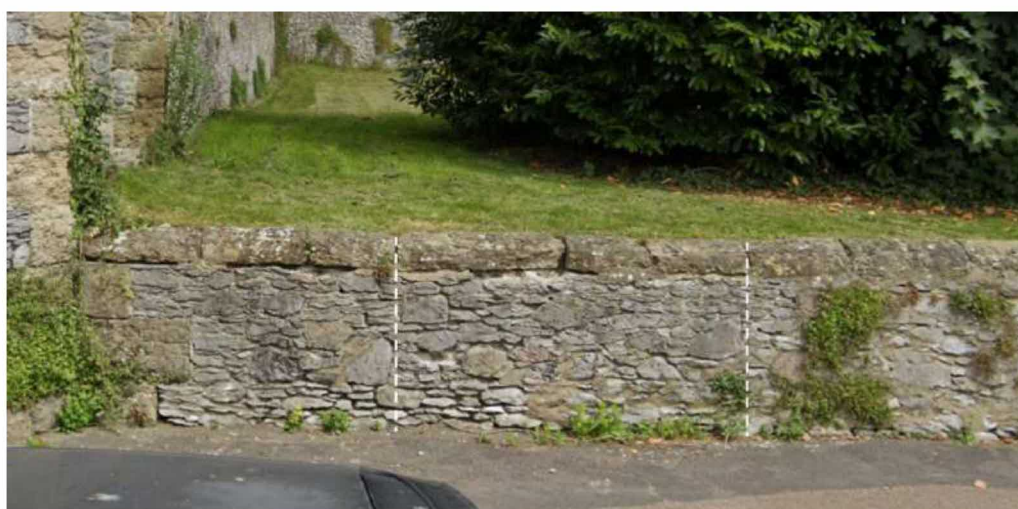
Section of lower, limestone stone wall and location of proposed breach.
